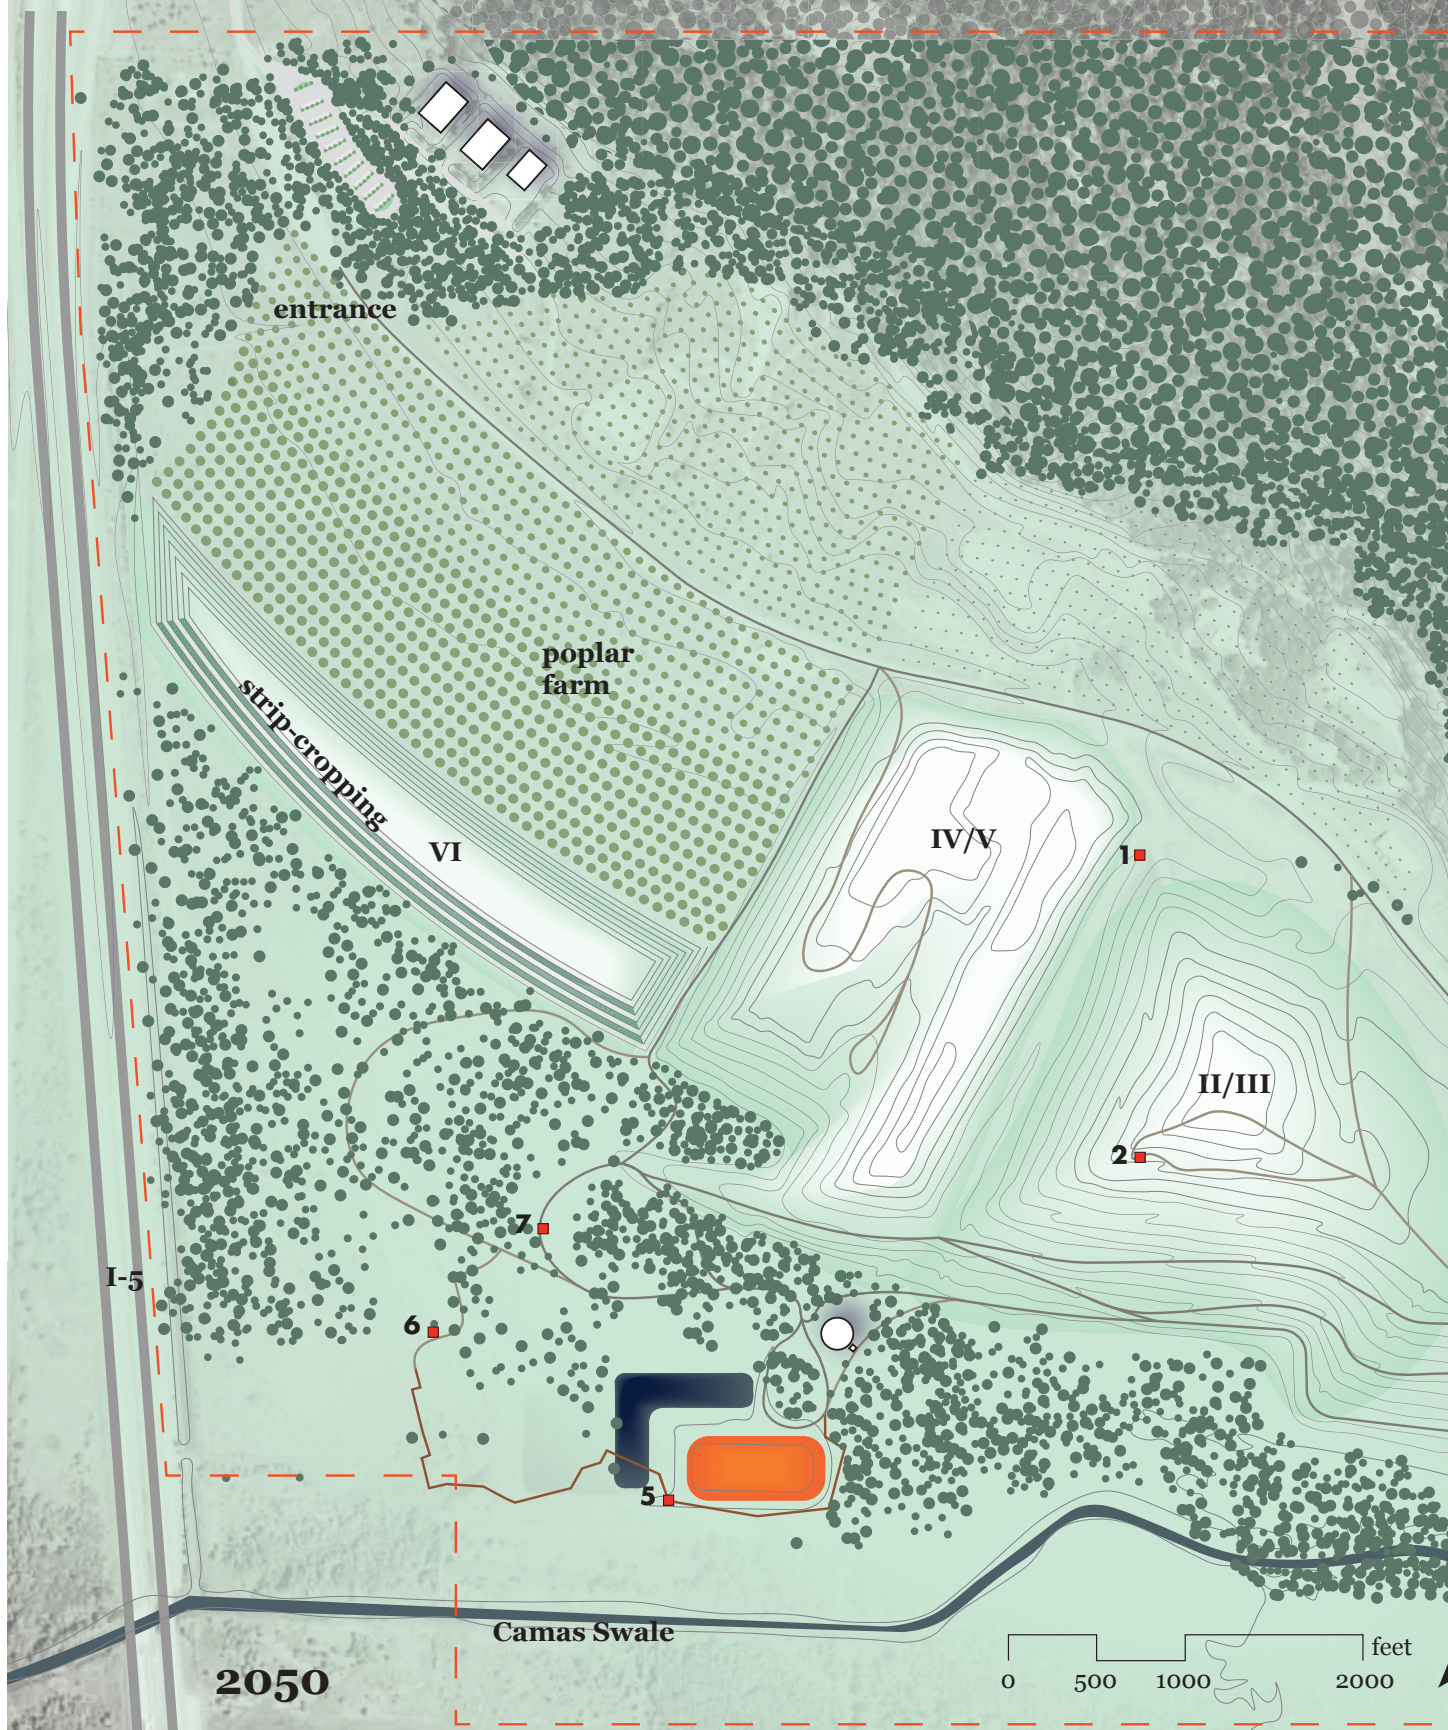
Site Plan of Short Mountain Landfill, 2050.
